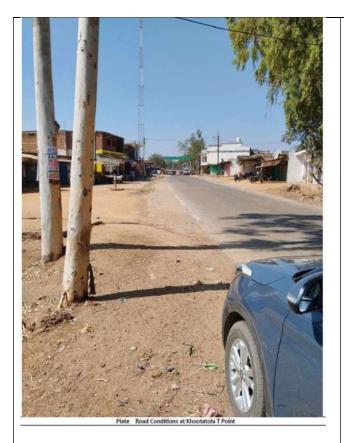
Road Conditions of Khootatola-Bhalumar Link Road (Kewai & Son River Bridges)
